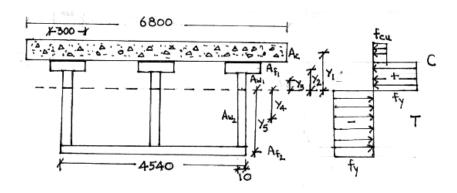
Transformed Cross-section of 2c-20 composite multi-cell box girder bridge
